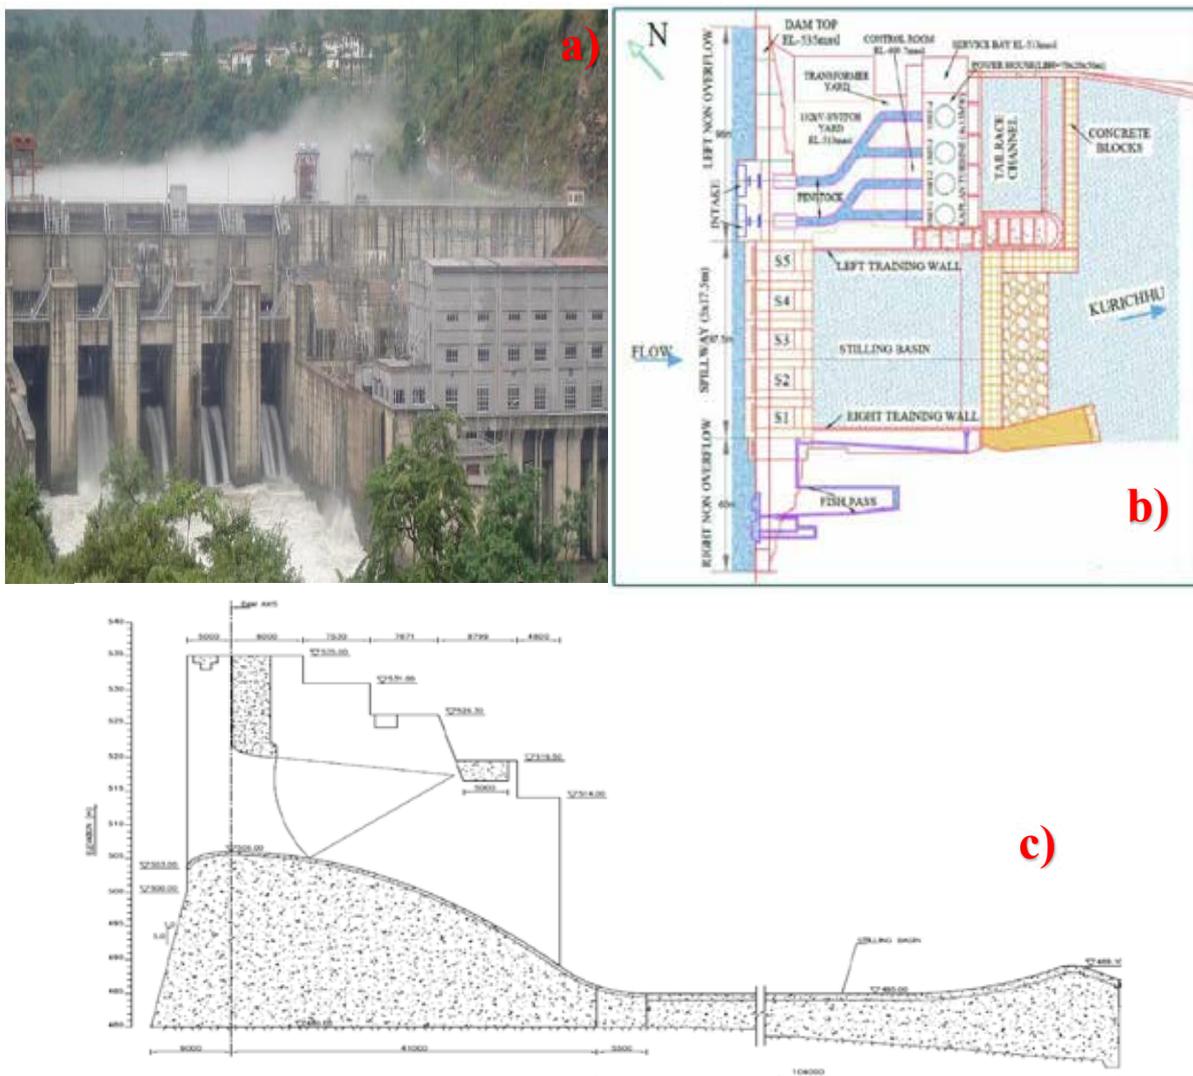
Kurichhu Hydropower: (a) Project site, (b) Headworks plan view, and (c) Spillway section
